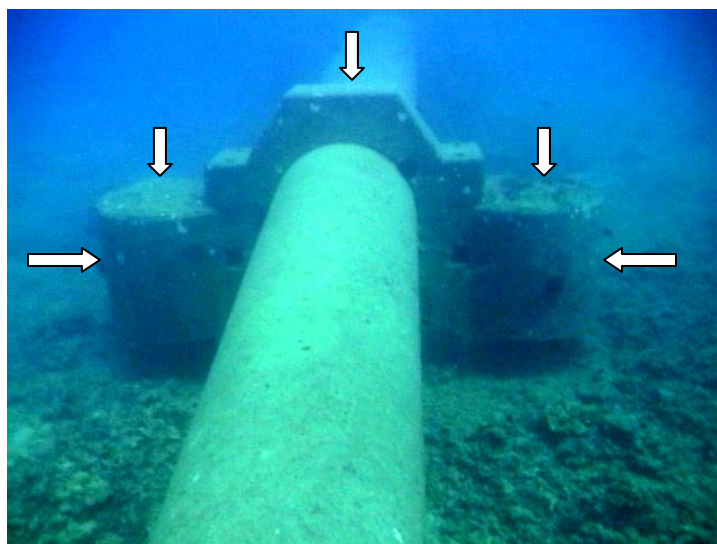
Fort Kamehameha wastewater outfall pipe and pile in a 27 m water depth, Pearl Harbor Entrance Channel, Mamala Bay, Hawai'i. Arrows point to where photo quadrats of the pile substrate were taken.
